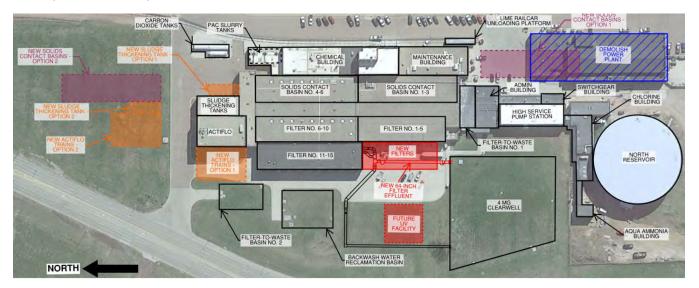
SFWPP SITE PLAN WITH ALL RECOMMENDED IMPROVEMENTS IMPLEMENTED
